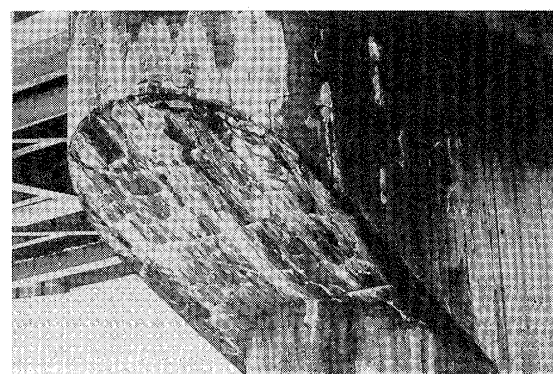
Severe cracks on gable parts of a pier which have been exposed to rainfall.
